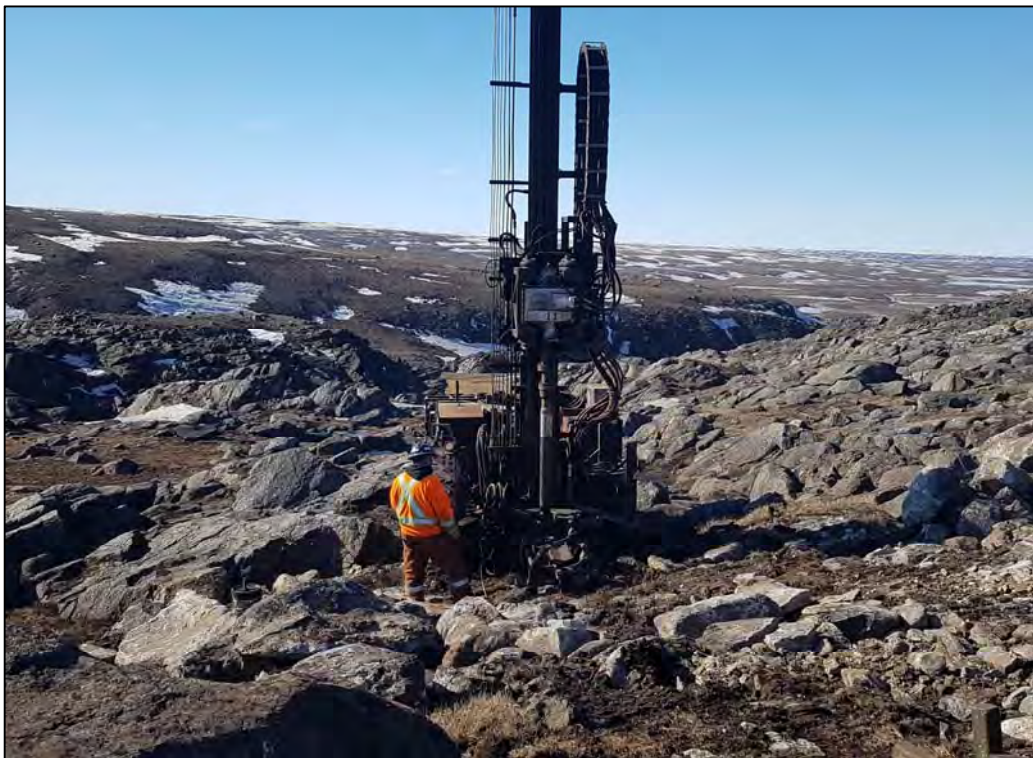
KM106-DH19-01 Looking West During Drilling
